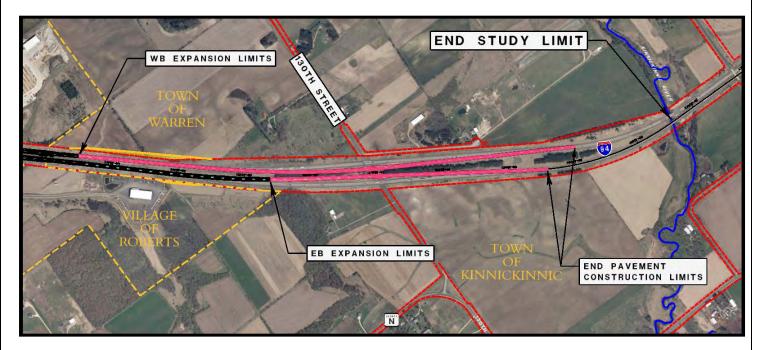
B – Proposed Reconstruction Limits Between 130th Street and the Kinnickinnic River
